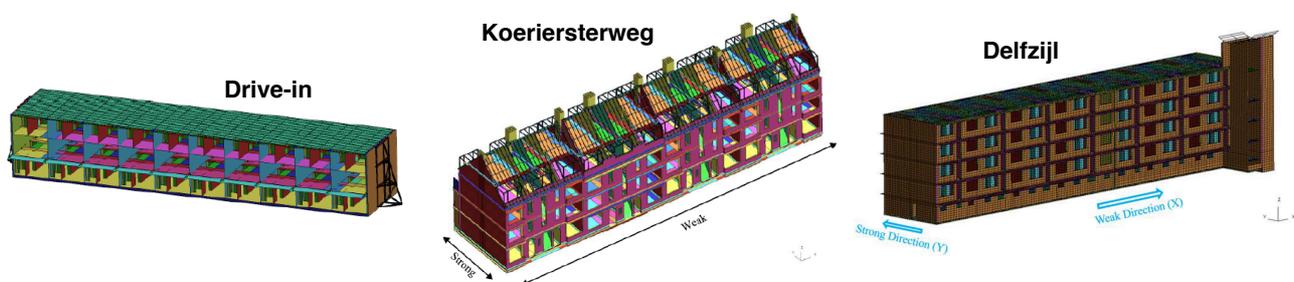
Screenshots of LS-DYNA models of URM index buildings with pile foundations
